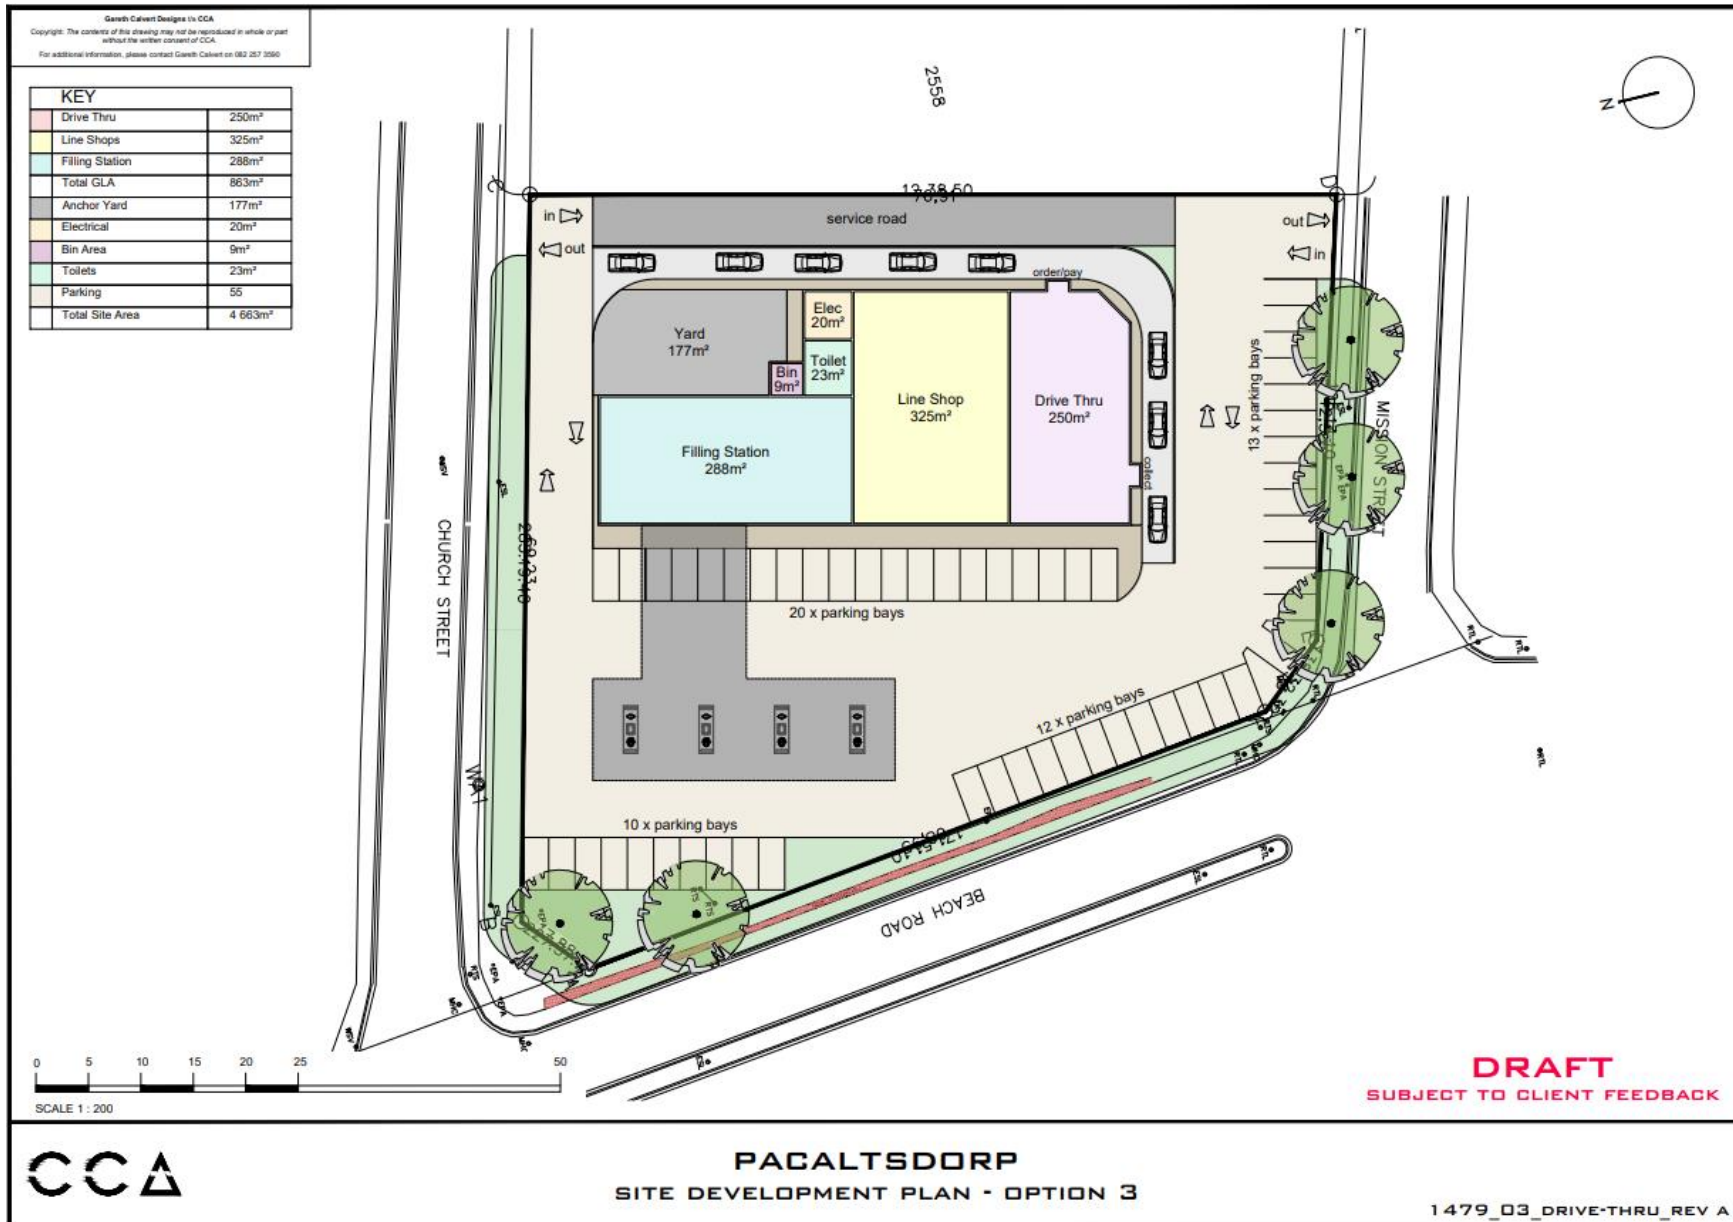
Site Development Plan (Gareth Calvert Designs t/a CCA, November 2024)
